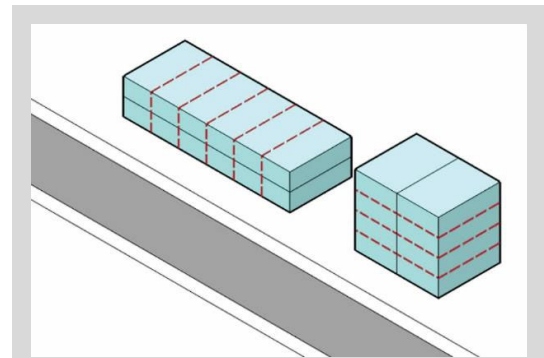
Illustration indicating the difference between terraced housing (left) and apartment building (right). Terraced housing units are separated by vertical party walls and may be over more than one floor, apartment buildings are separated horizontally and are usually (though not exclusively) contained to one floor. Source: (Auckland Council, 2020)
